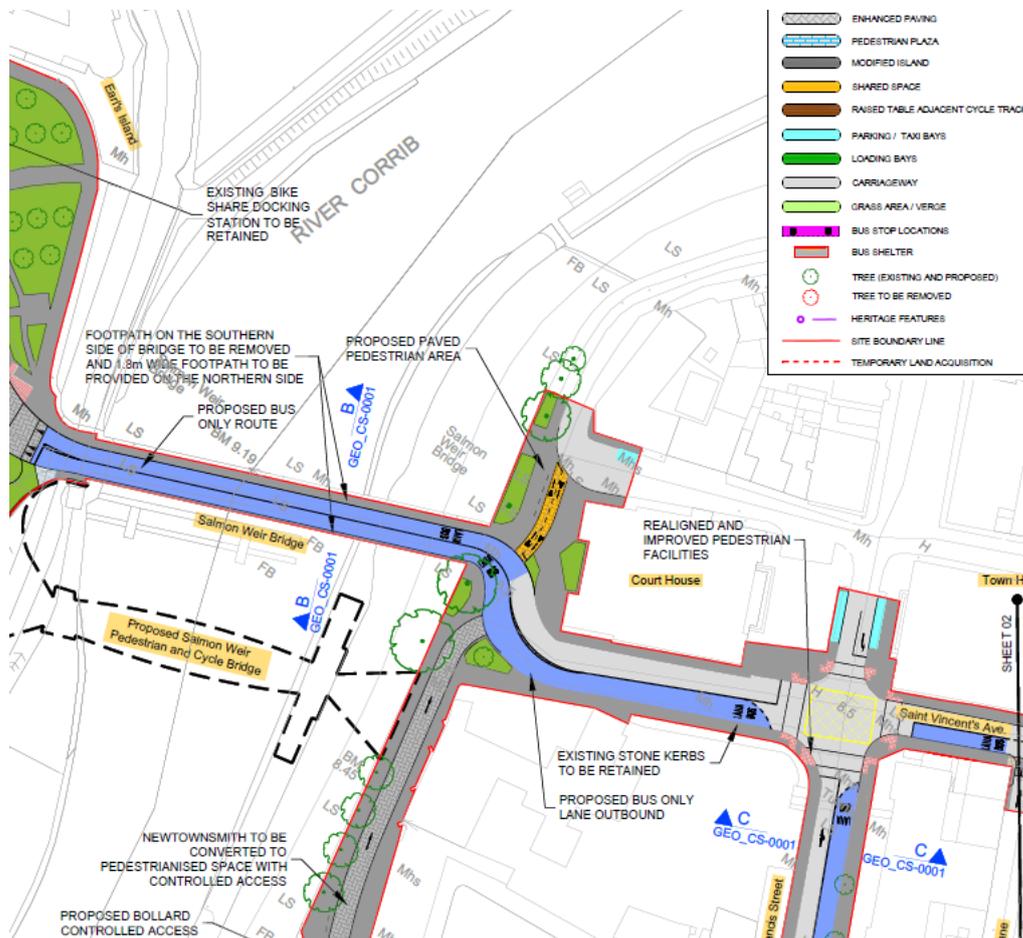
Extract from EIAR General Arrangement Drawing at Galway Courthouse
